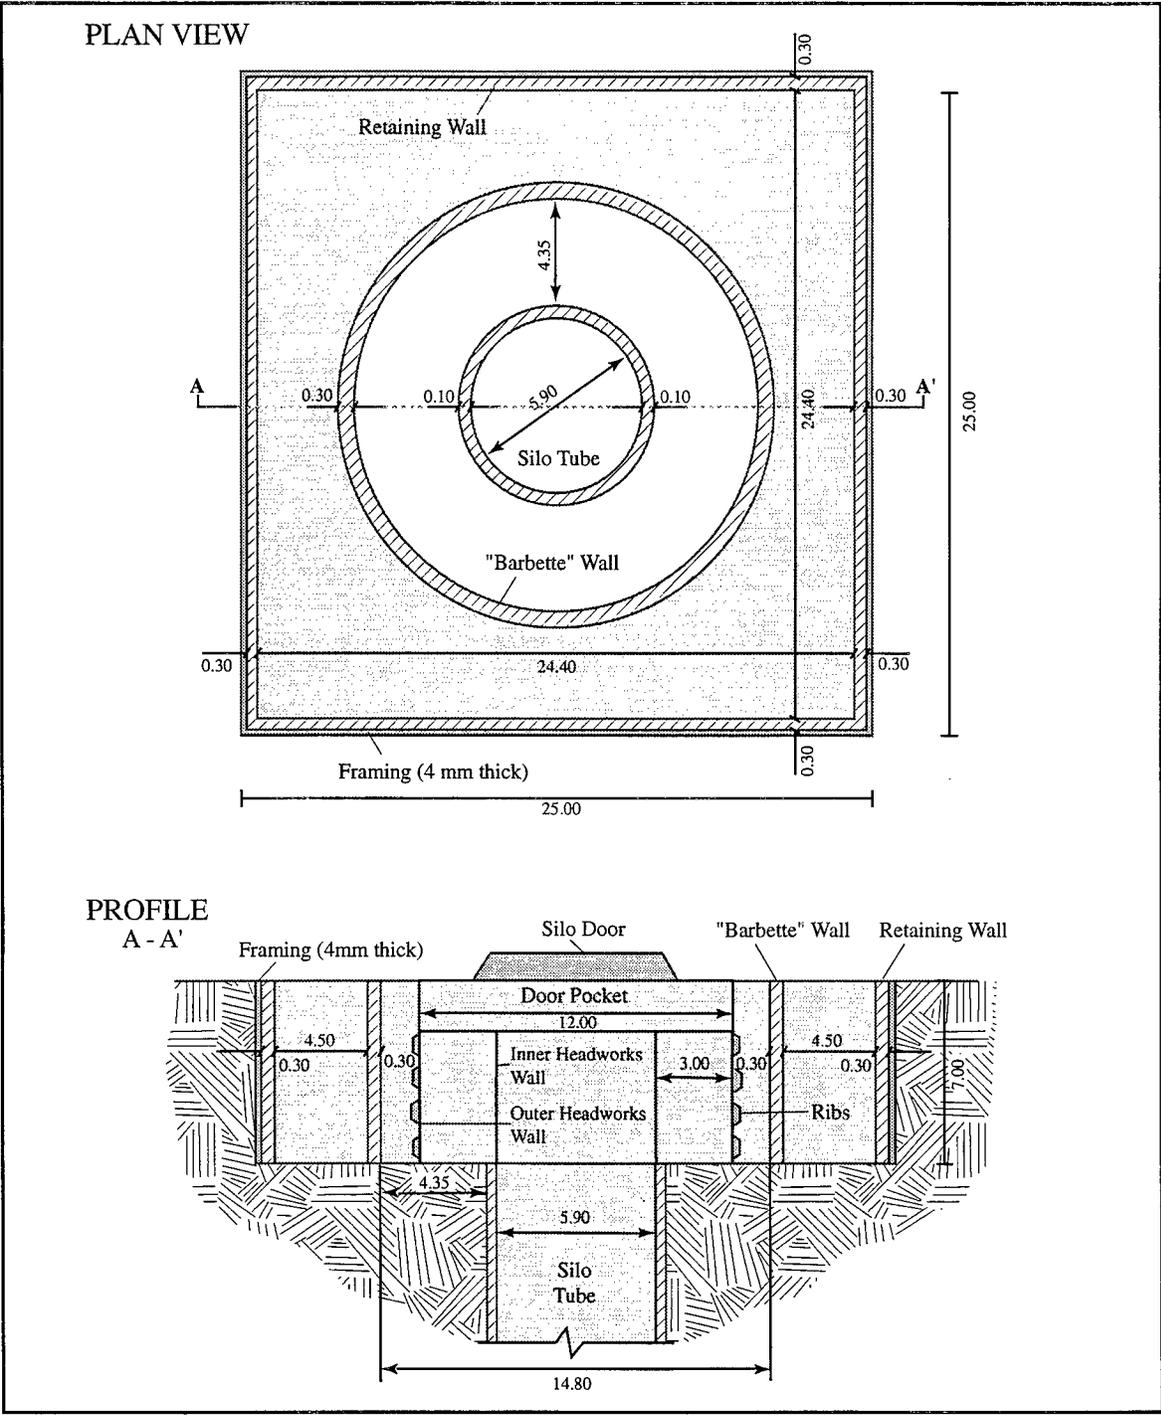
Plan and cross section drawings of the outer retaining wall, the inner "barbette" sectional wall, and the silo headworks area. The configuration and dimensions of the silo door, door pocket, and inner and outer headworks walls are estimated from the site photography. Derzhavinsk, Regiment 2, Silo 3. All measurements are in meters.
